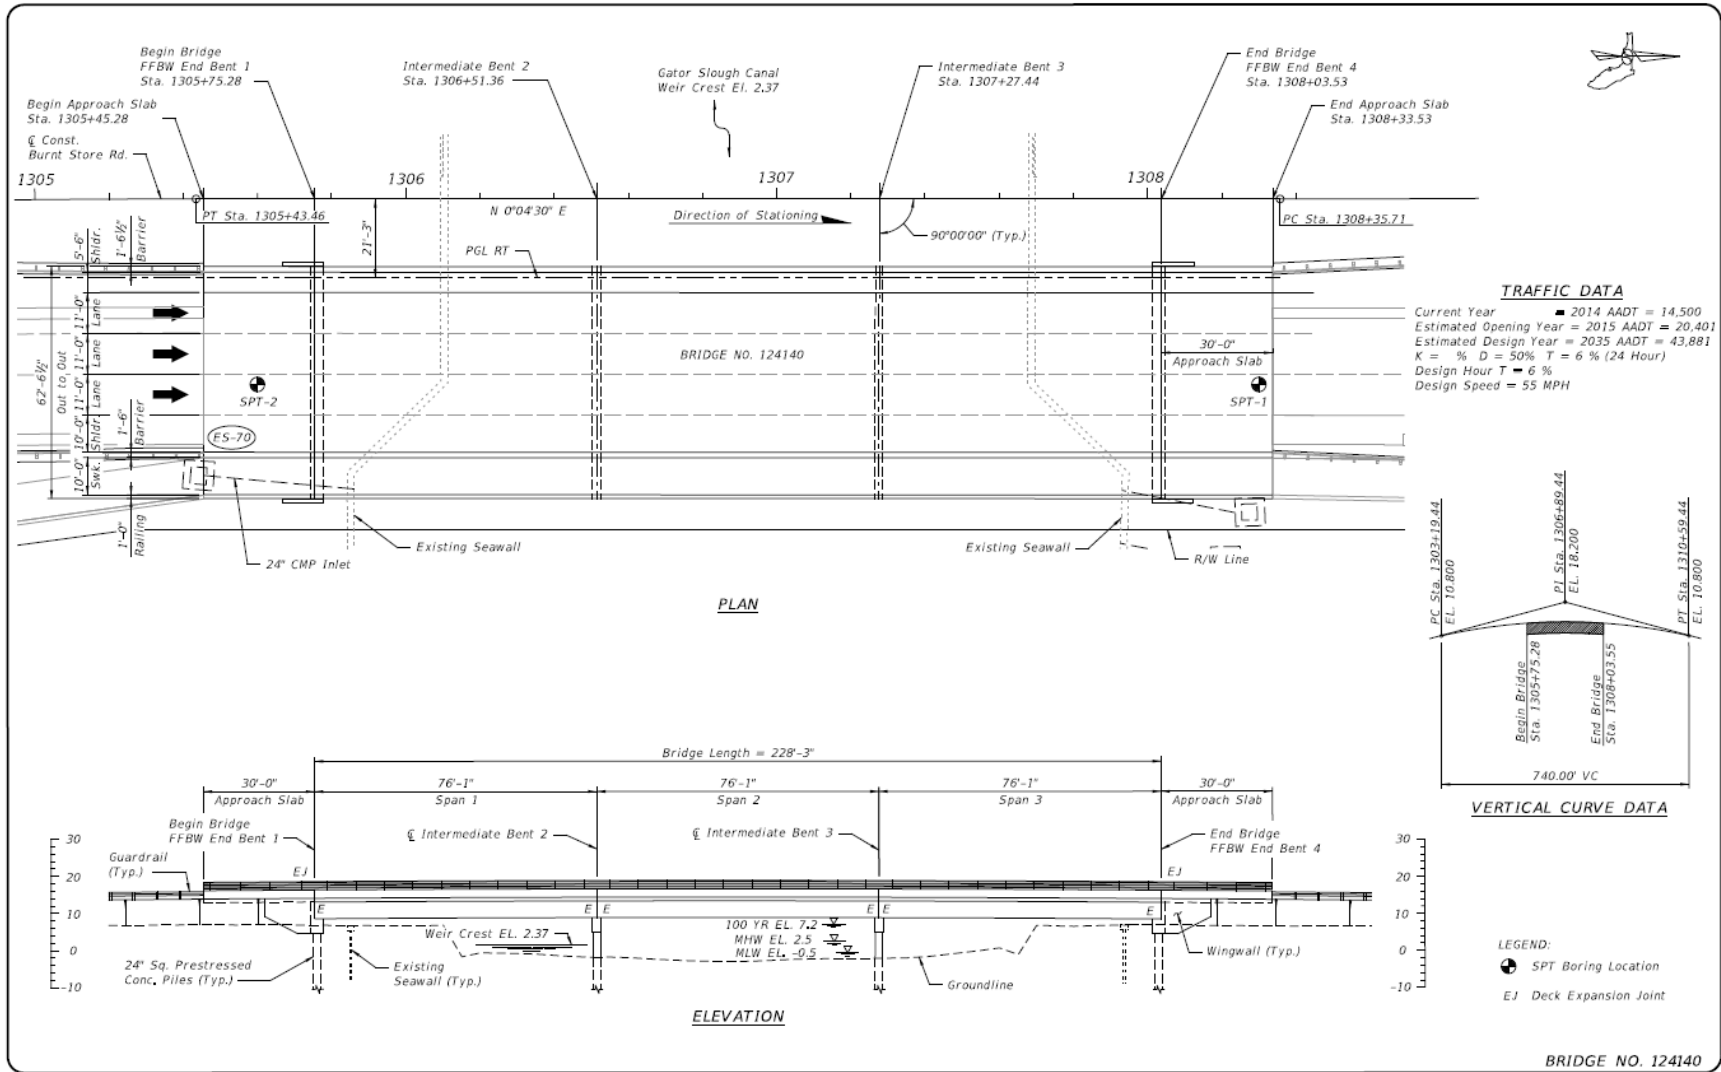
Plan and Elevation Sheet of the North Bound Bridge (Source: Scalar)
